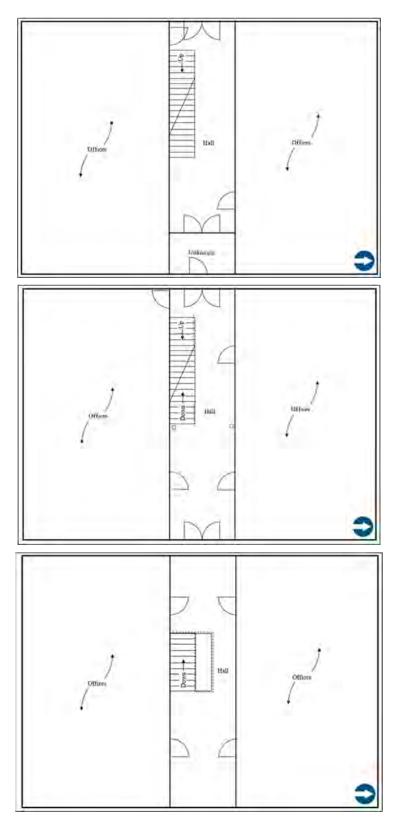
BASEMENT LEVEL PLAN (TOP); FIRST STORY PLAN (MIDDLE); SECOND STORY PLAN (BOTTOM) (NOT TO SCALE)
